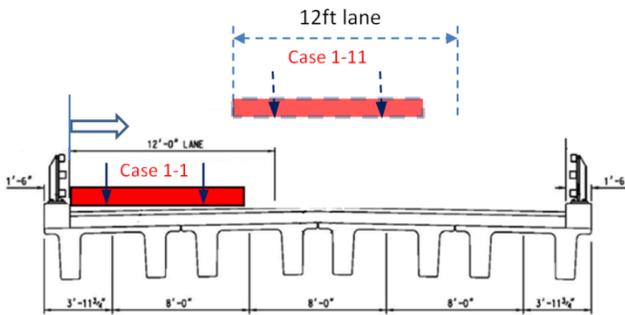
Loading profile for Case 1-1 (note: bridge section adapted from [2])
